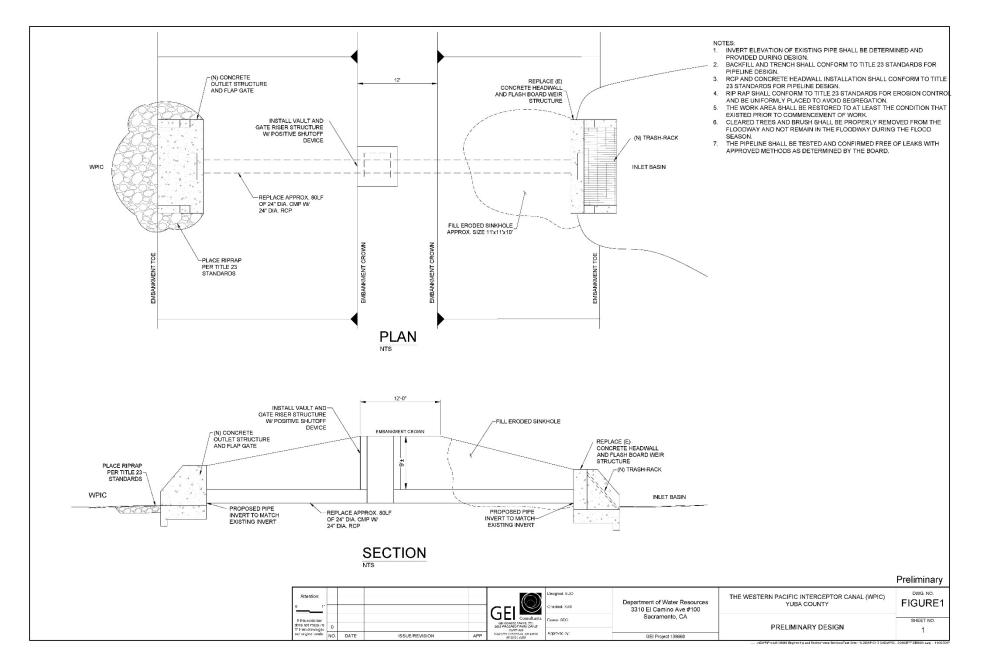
WPIC Culvert Replacement Plans and Cross Section
